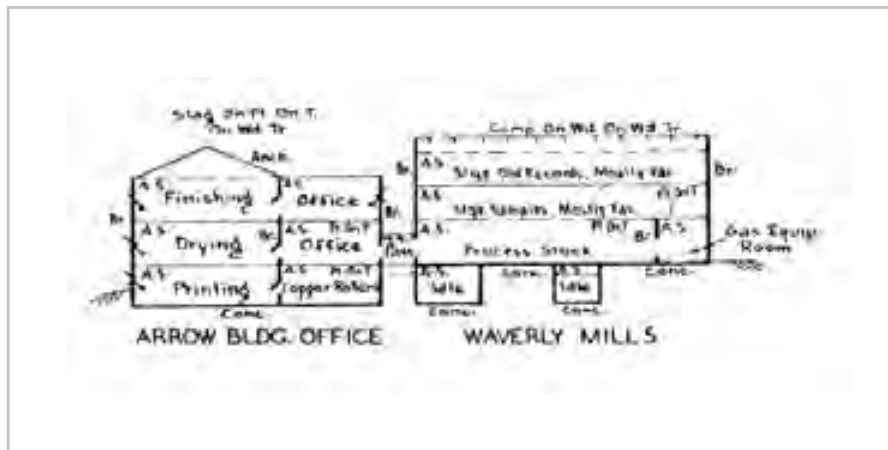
Factory Mutual Insurance Co. *Mill Realty Co.* 1965. West-east cross-section through the Arrow Building Office and the Waverly Mills. Scale: 1 inch= 30 feet (approximately).
